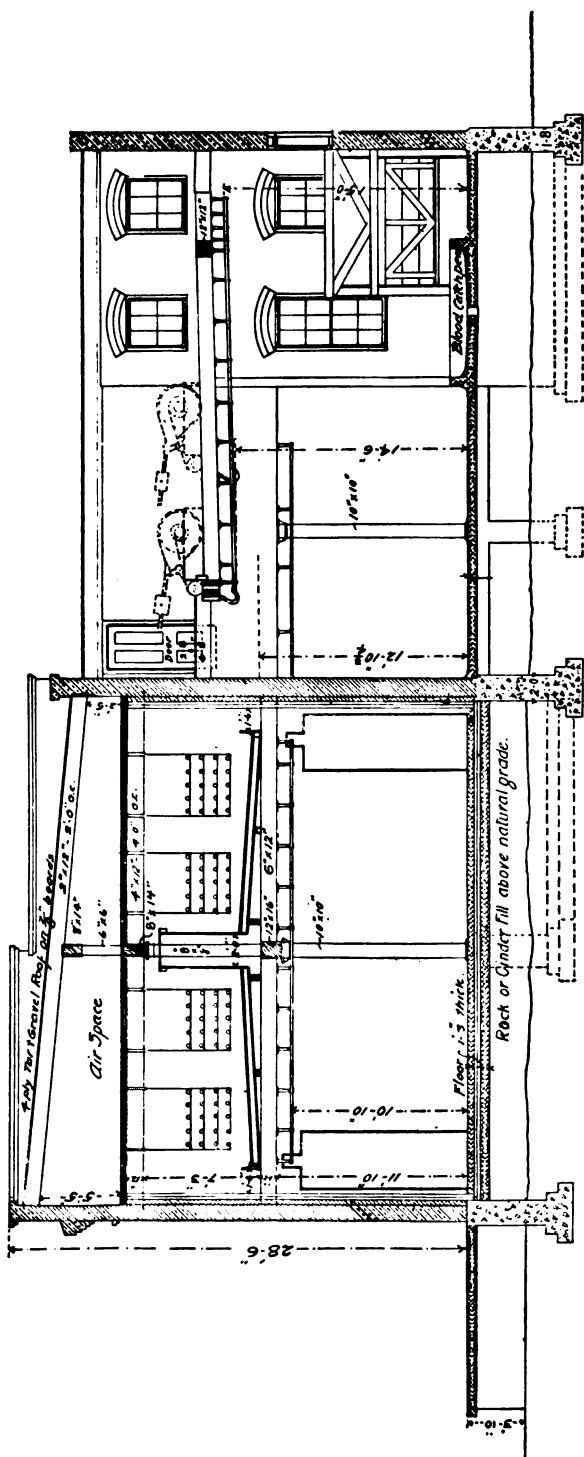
Cross section of municipal slaughterhouse. (Section on line E-F in fig. 17.)
